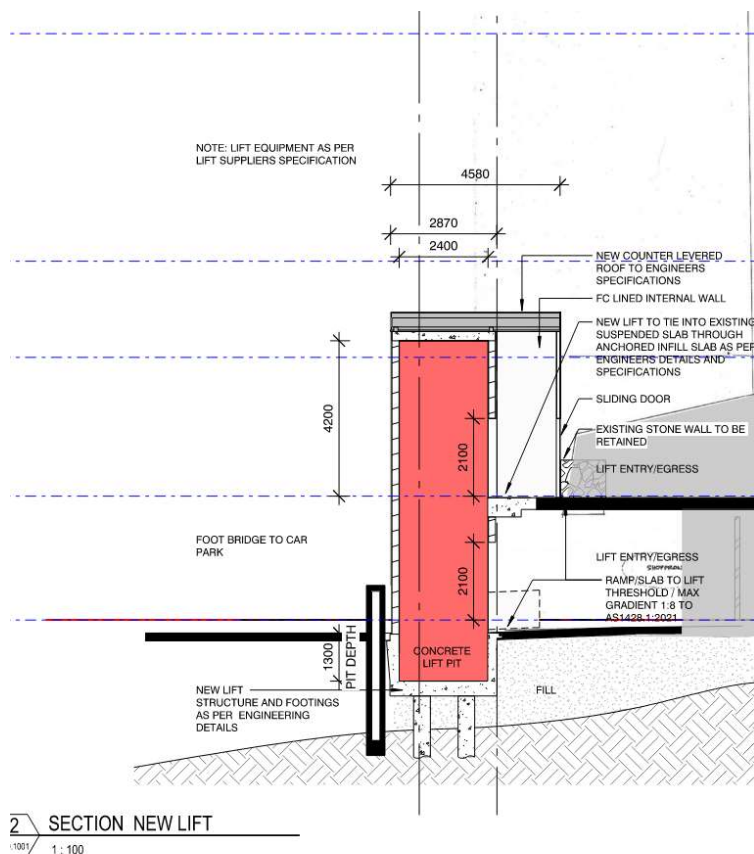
Excerpt from section of the proposed development illustrating the excavation proposed.
